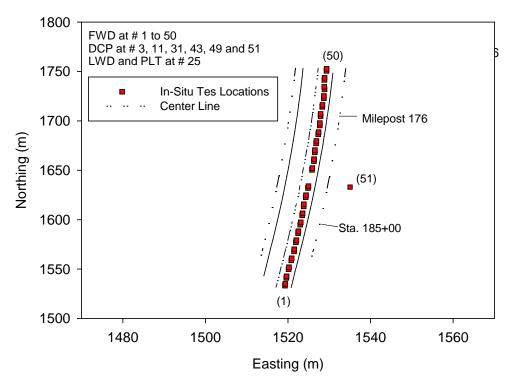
Test section plan layout with RTK GPS test locations US 75 NB Jackson County, Kansas
